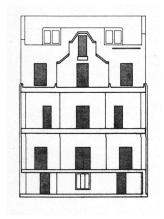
12 openings were created in the wall of the old building to connect the old and new parts.
